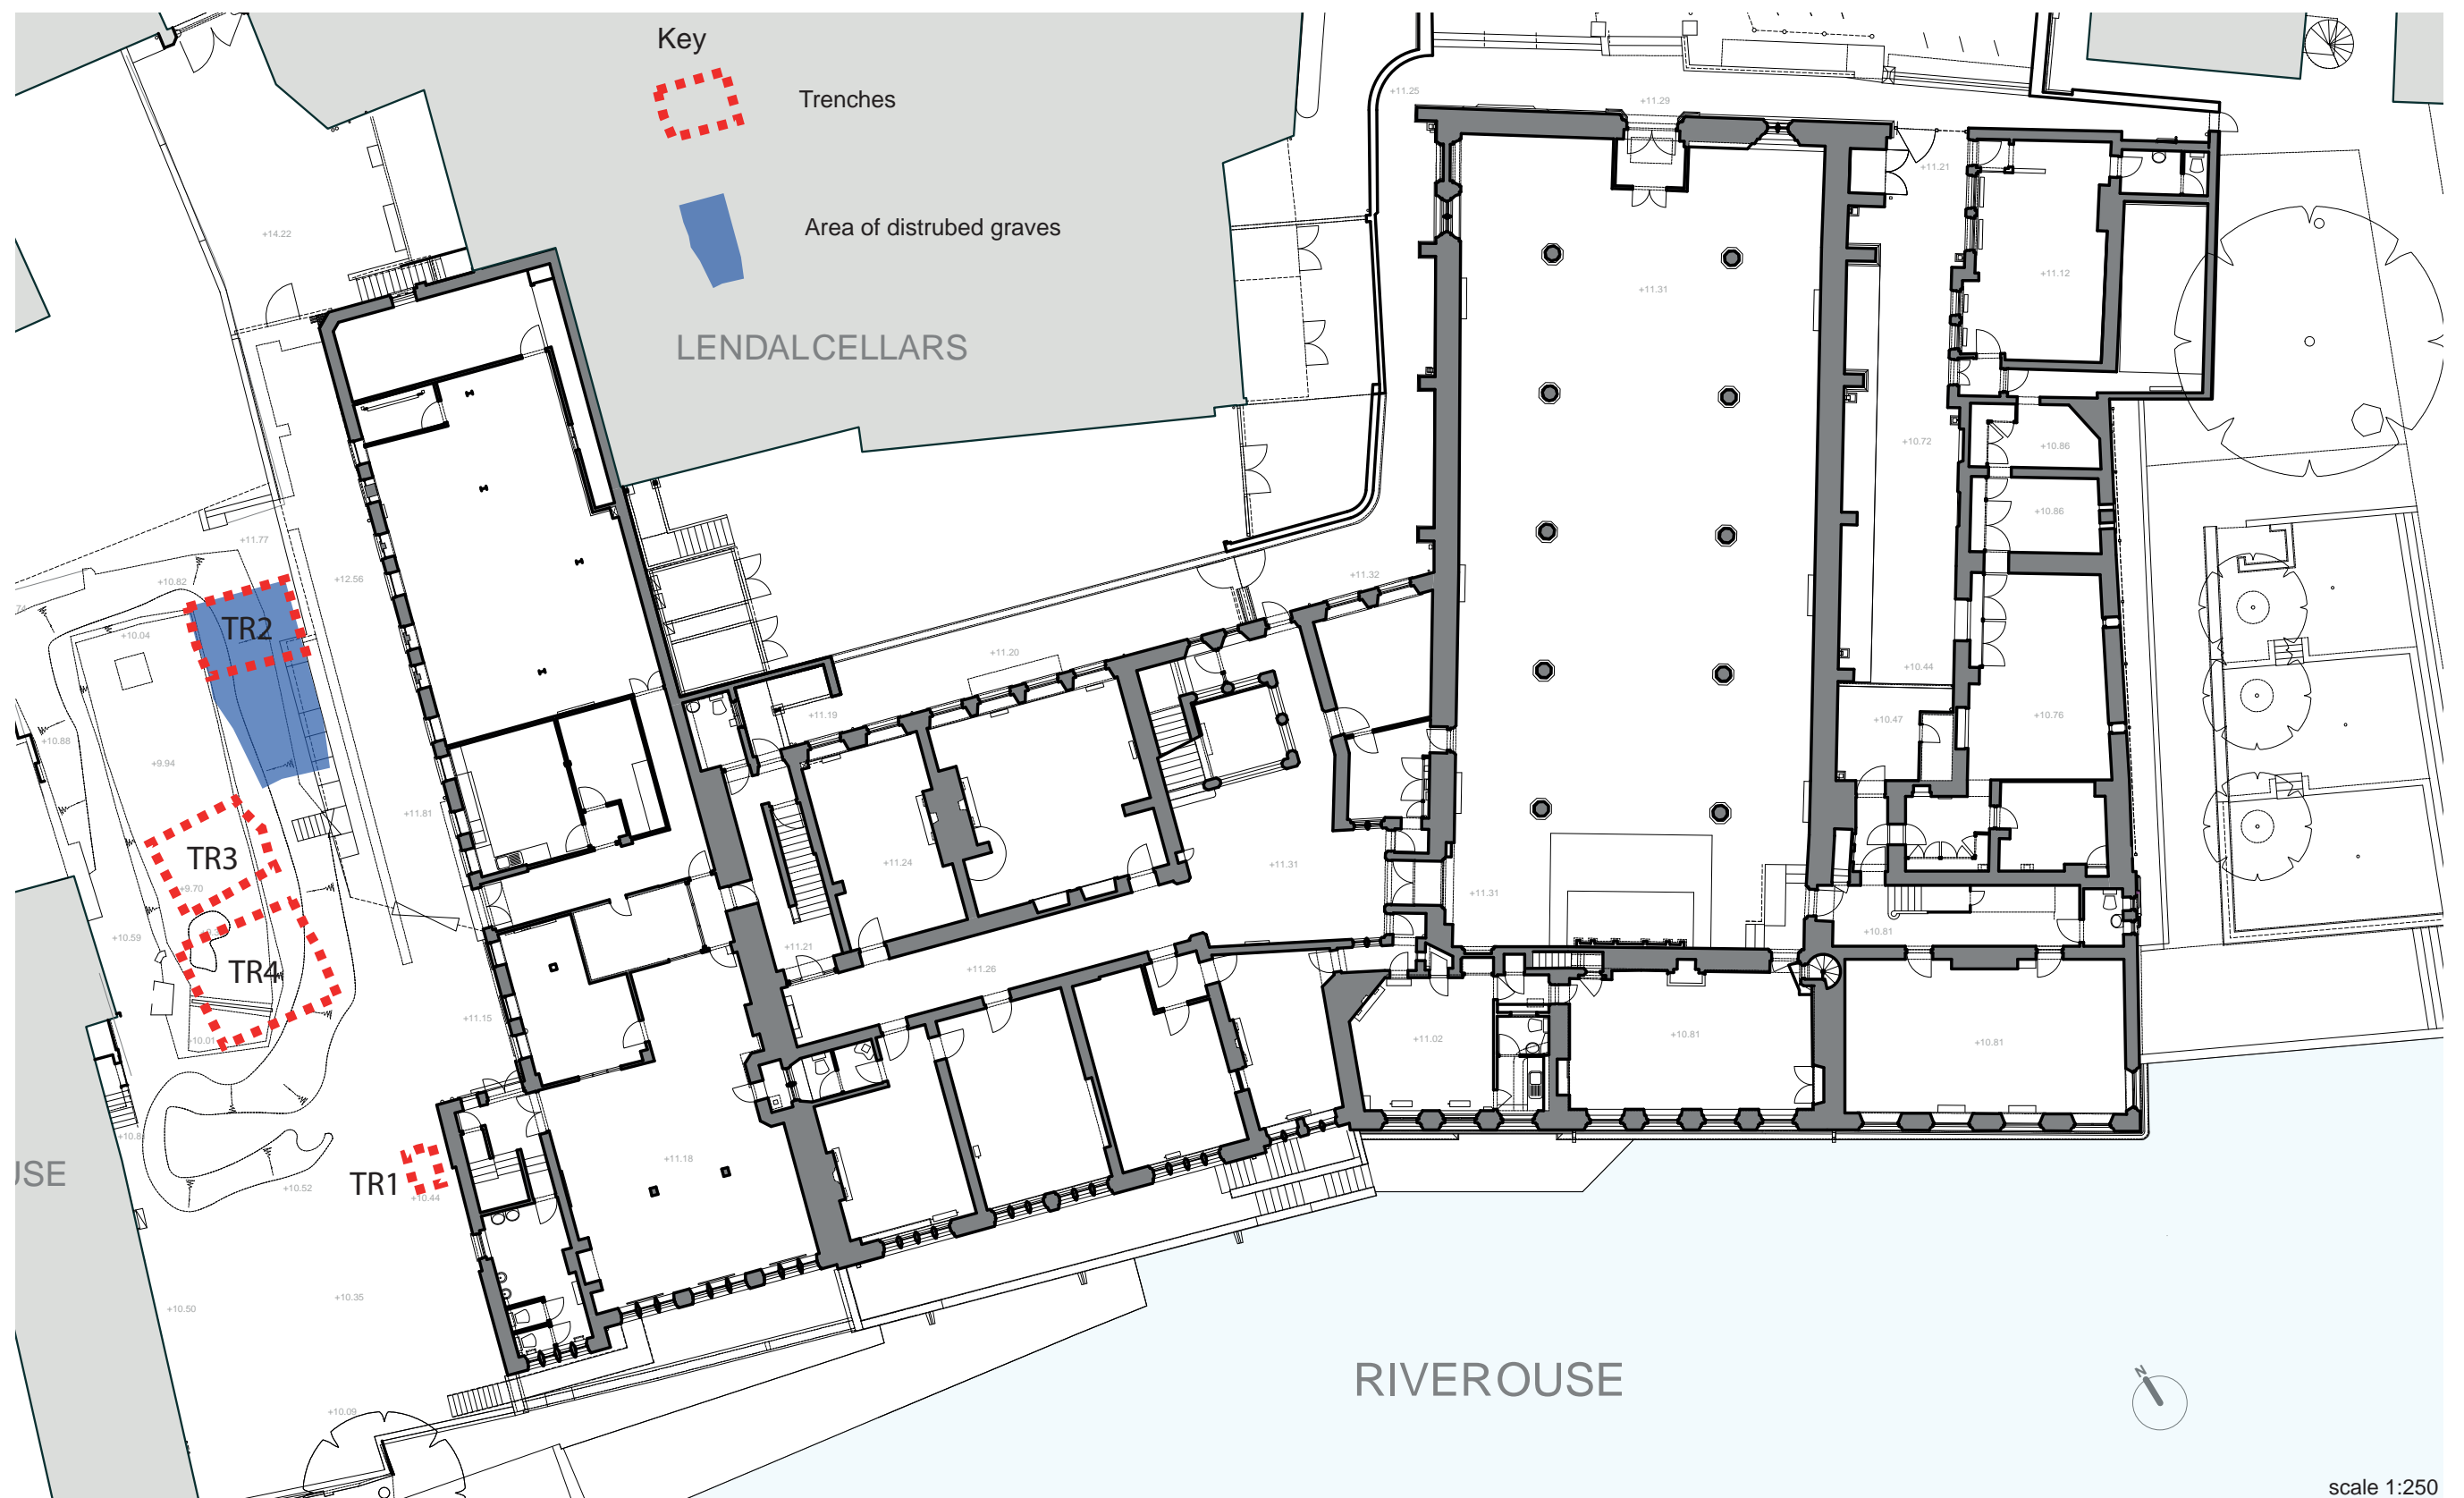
North Annexe excavation trench locations (after drawing 16/01971/FULM - AL(0)0400.P5)
